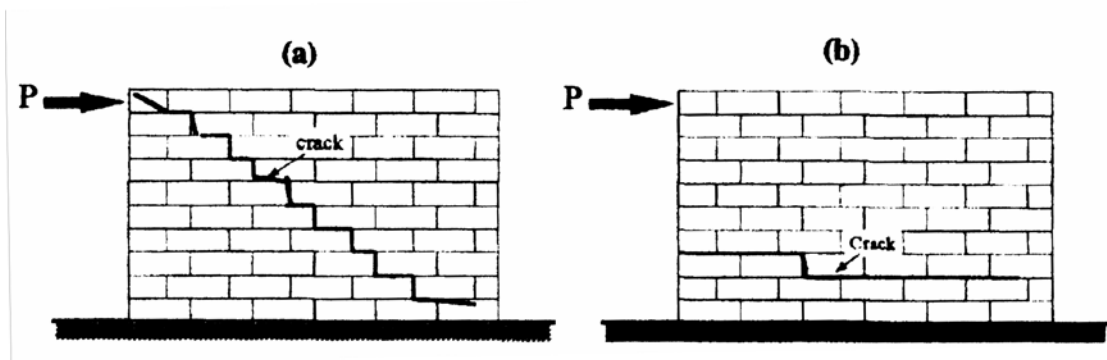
Modes of failure in URM wall subjected to lateral load P
